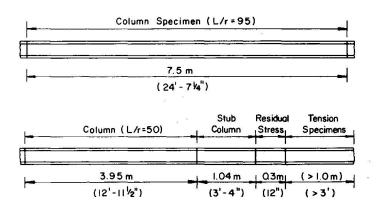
Schematic Layout of Test Specimen from Each Rolling
